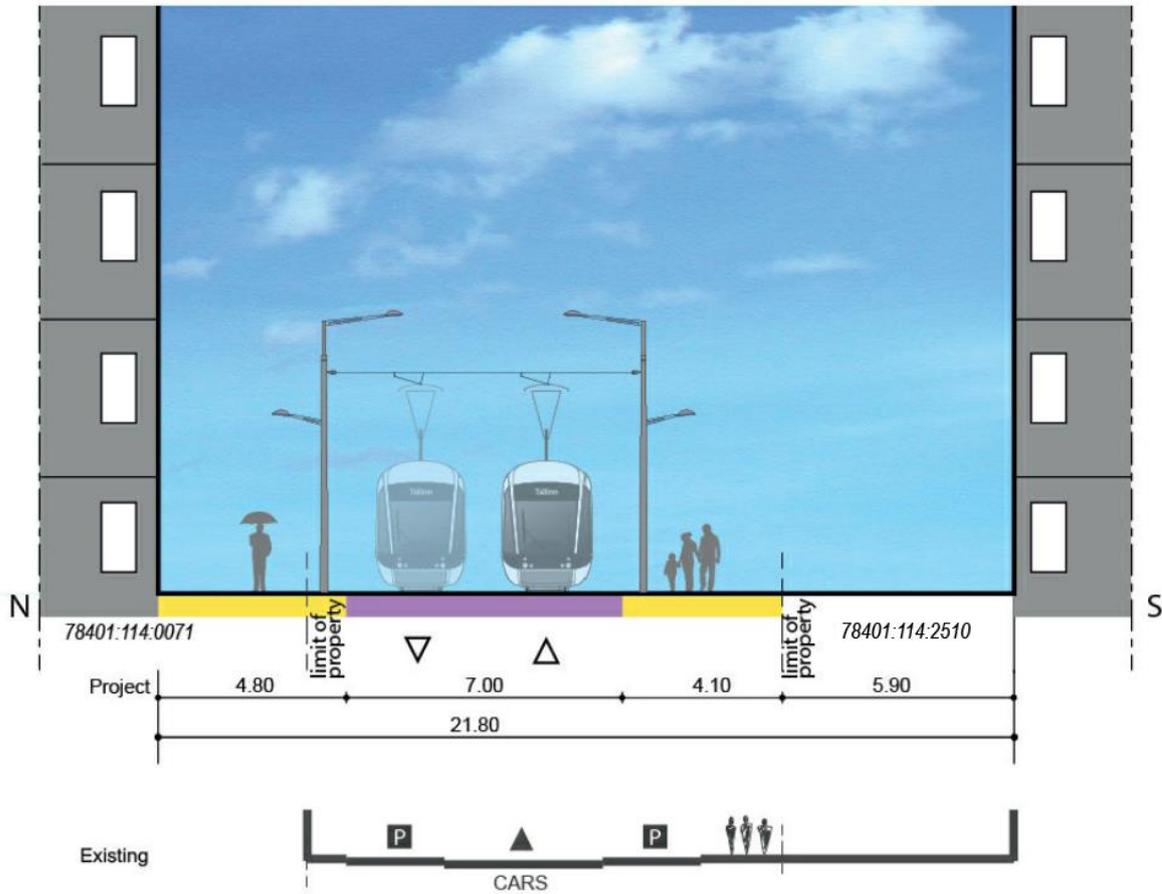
Tram solution – cross section n°1 on the East side of Laeva Street – Egis
